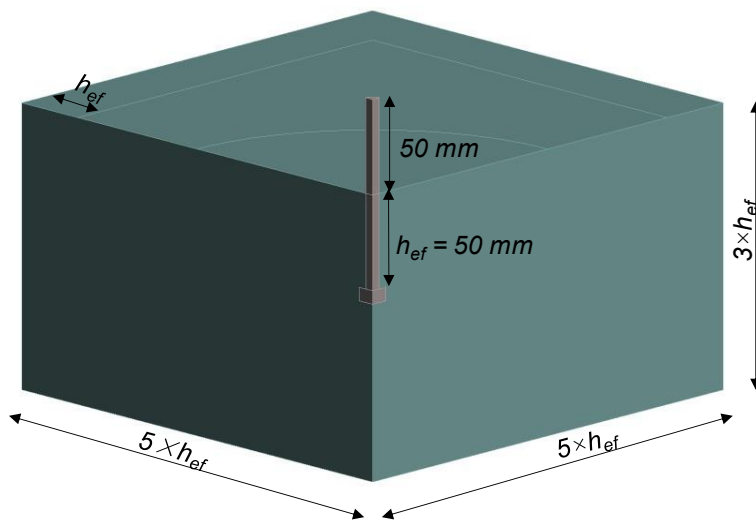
Geometric details of the headed stud and the concrete slab (one-fourth)
